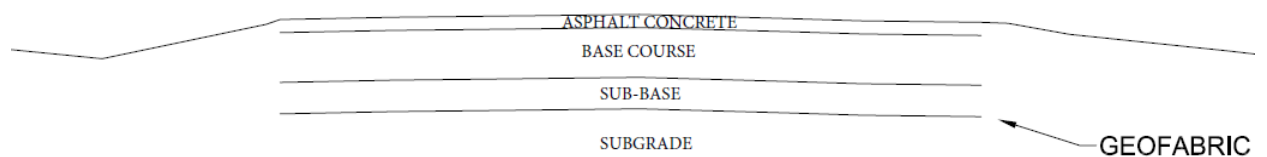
The as-built cross section of the test section FWD4-4. Horizontal scale is equal to vertical scale.
